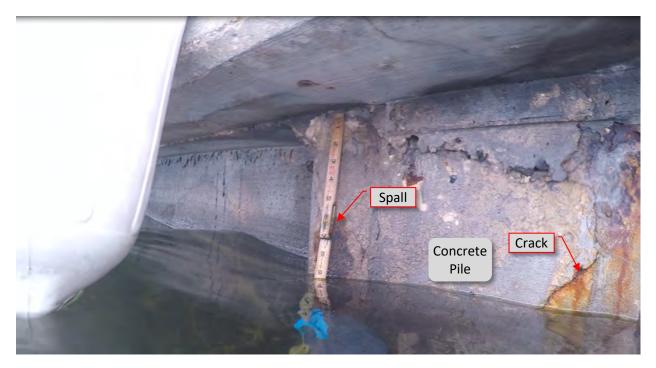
P15. STA 3+48. Cracks/spalls at each flange at pile.
